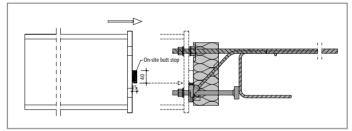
Schöck Isokorb® type KS: Assembly of steel beam with on-site butt-stop
